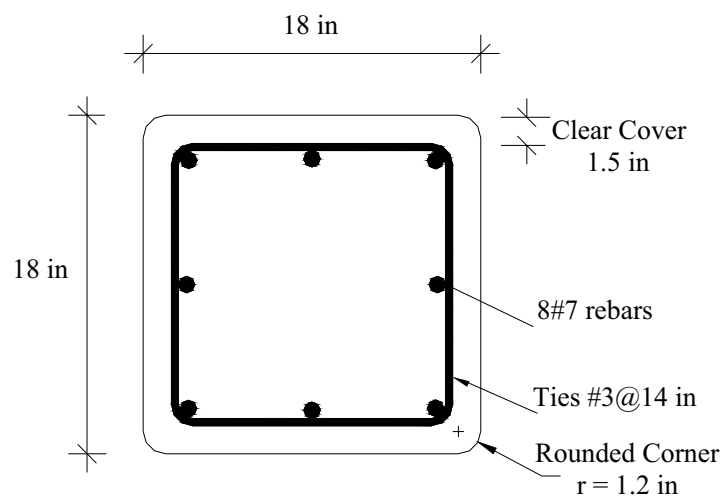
Section A-A & C-C; Specimens C1, C2 & C3
